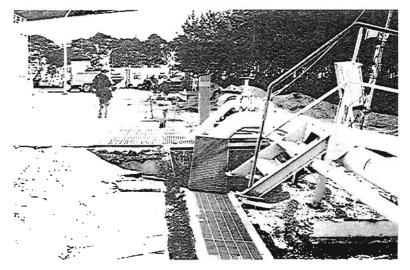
2 Step in road, Higashi Nada GT Power Station
